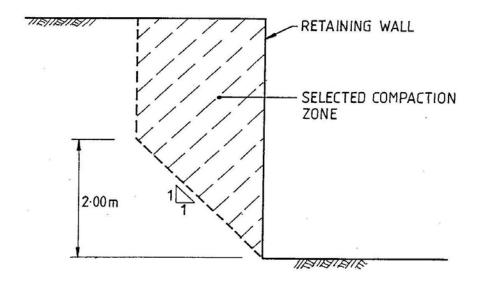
ZONE REQUIRING SELECTED COMPACTION BEHIND A RETAINING WALL.
